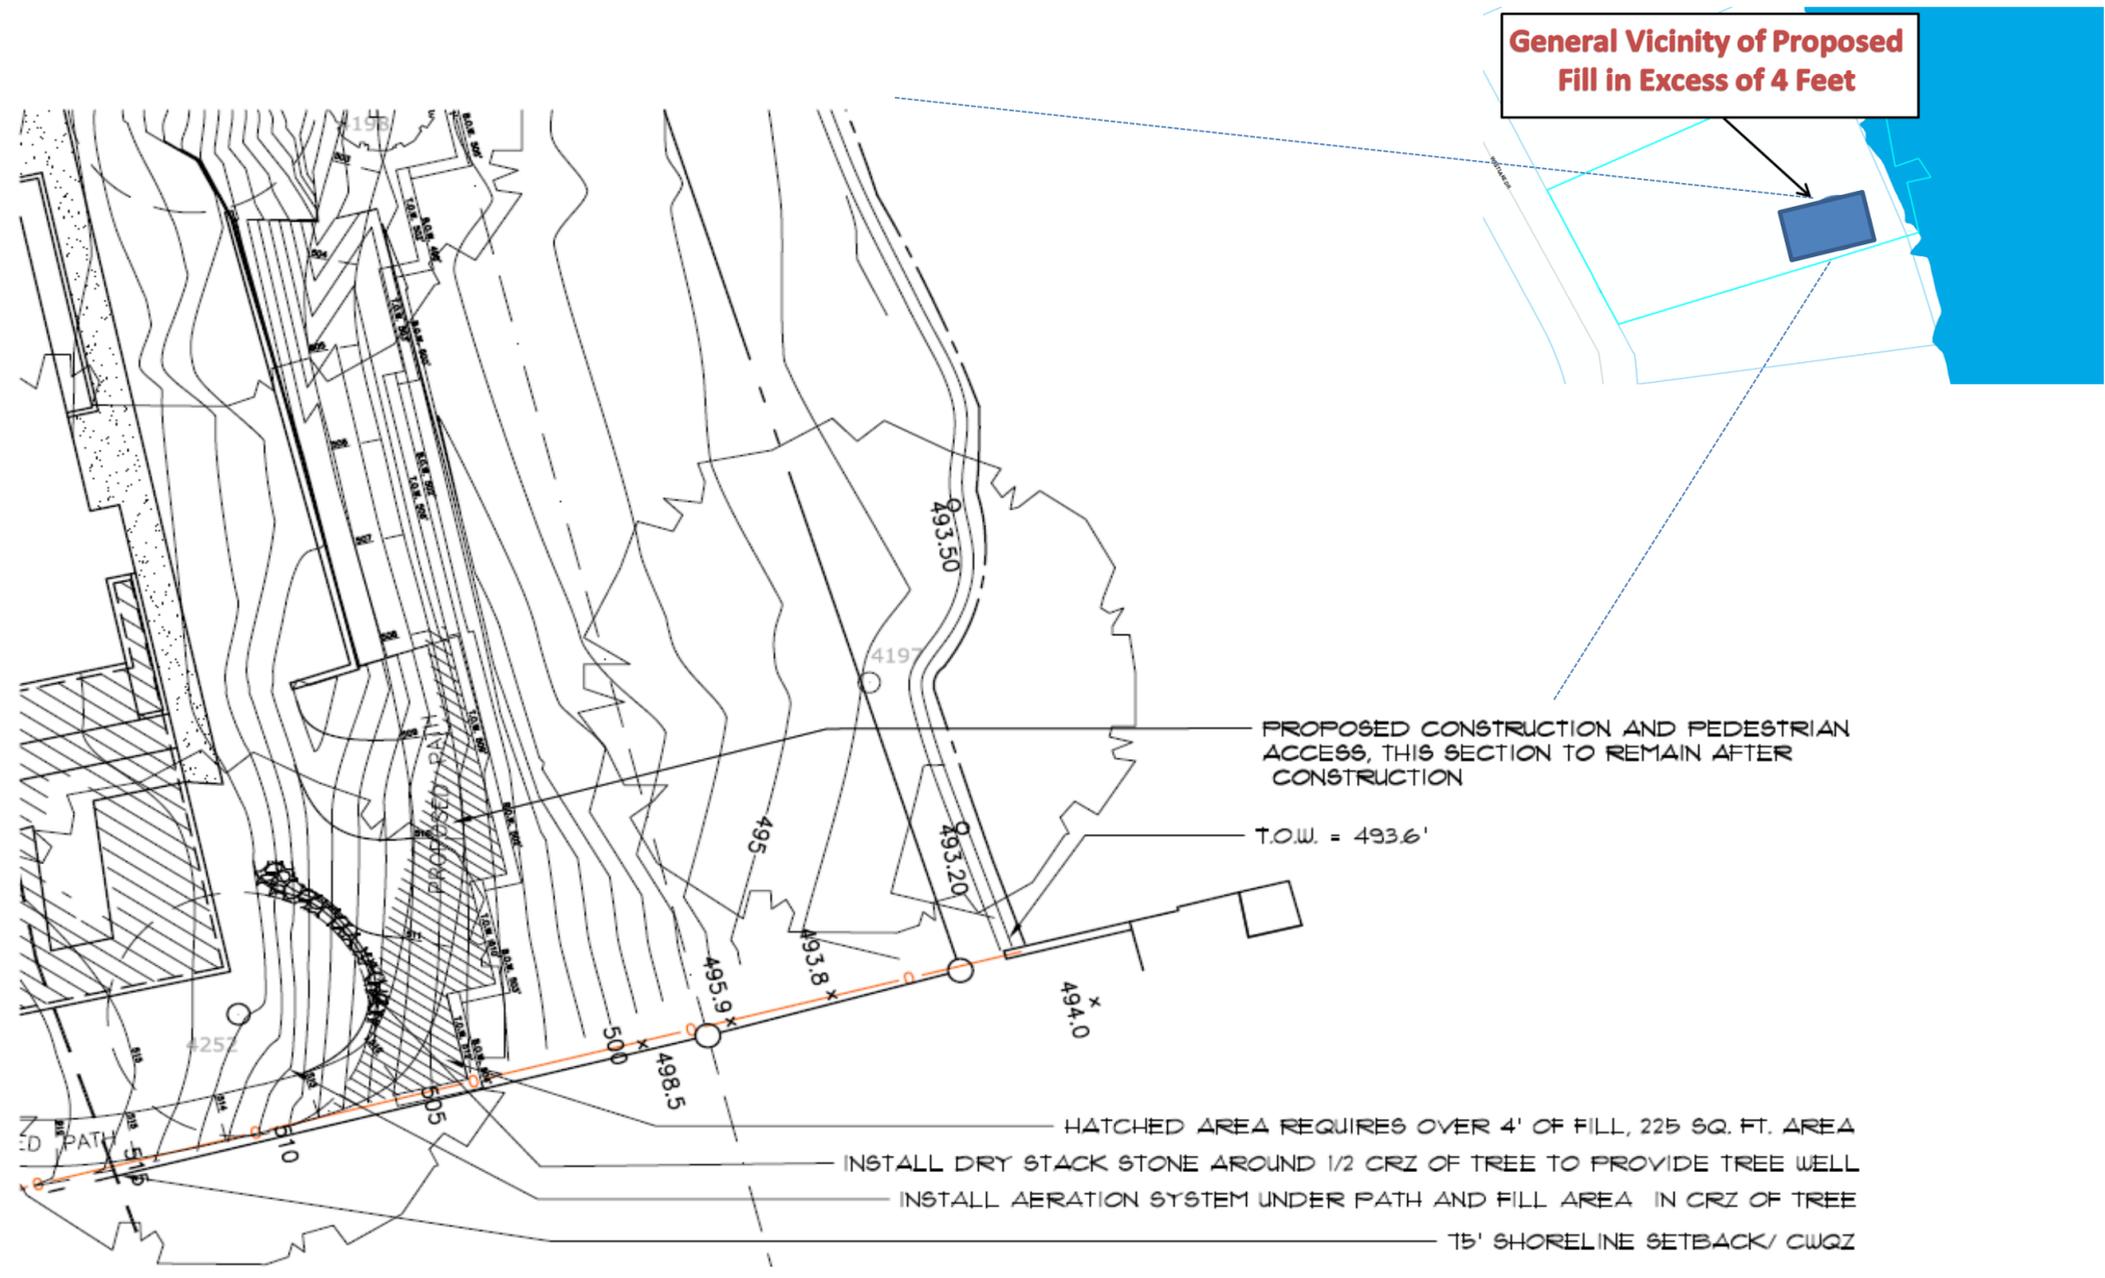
Proposed Fill Greater than 4 Feet Map
